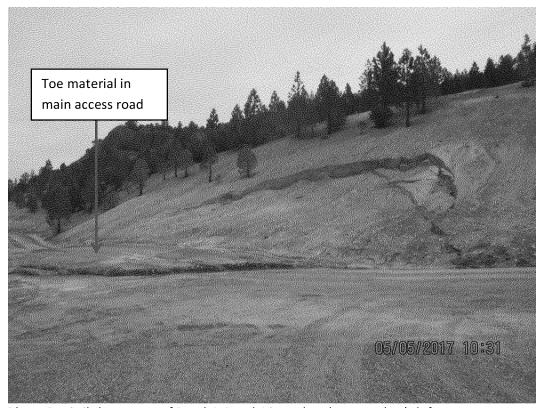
Soil slump east of Pond 4, Pond 4 is to the photographer's left
